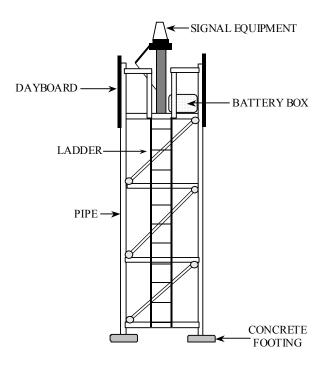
Freestanding Pipe Skeleton with Concrete Footings on Land
